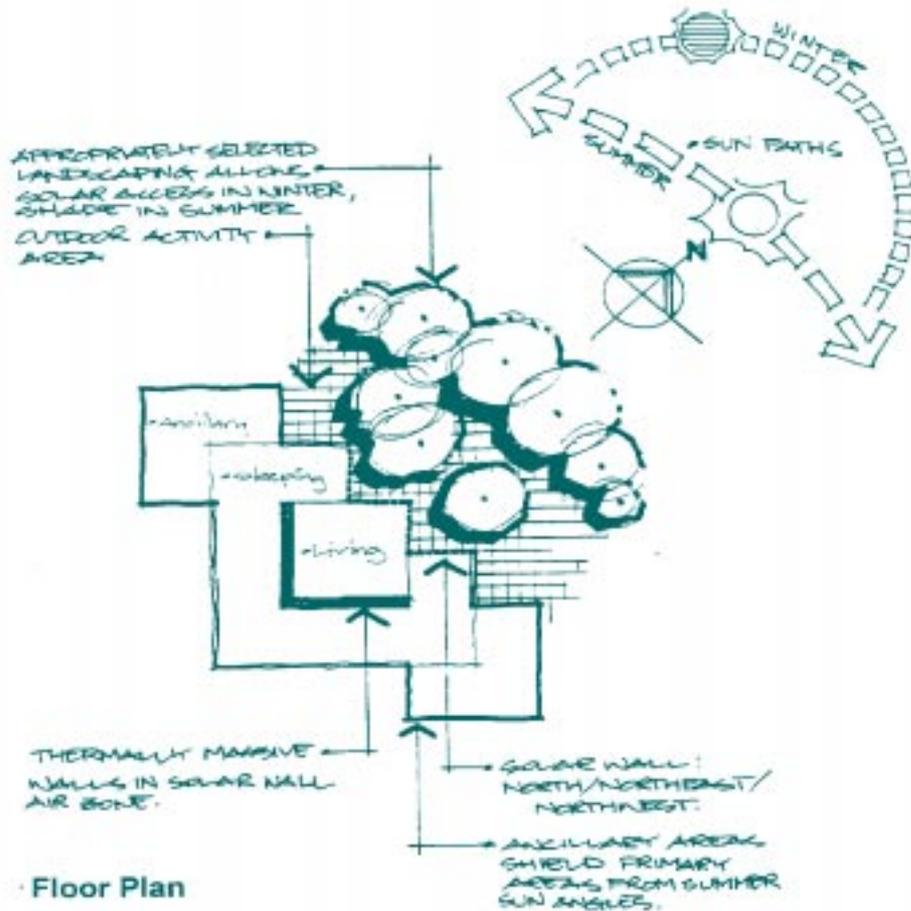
Dwelling layout and site planning considerations for the Hot Arid Zone.
